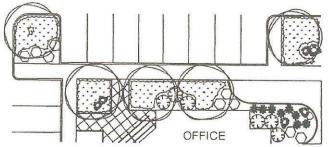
PARKING LOT LANDSCAPE CONCEPTS
